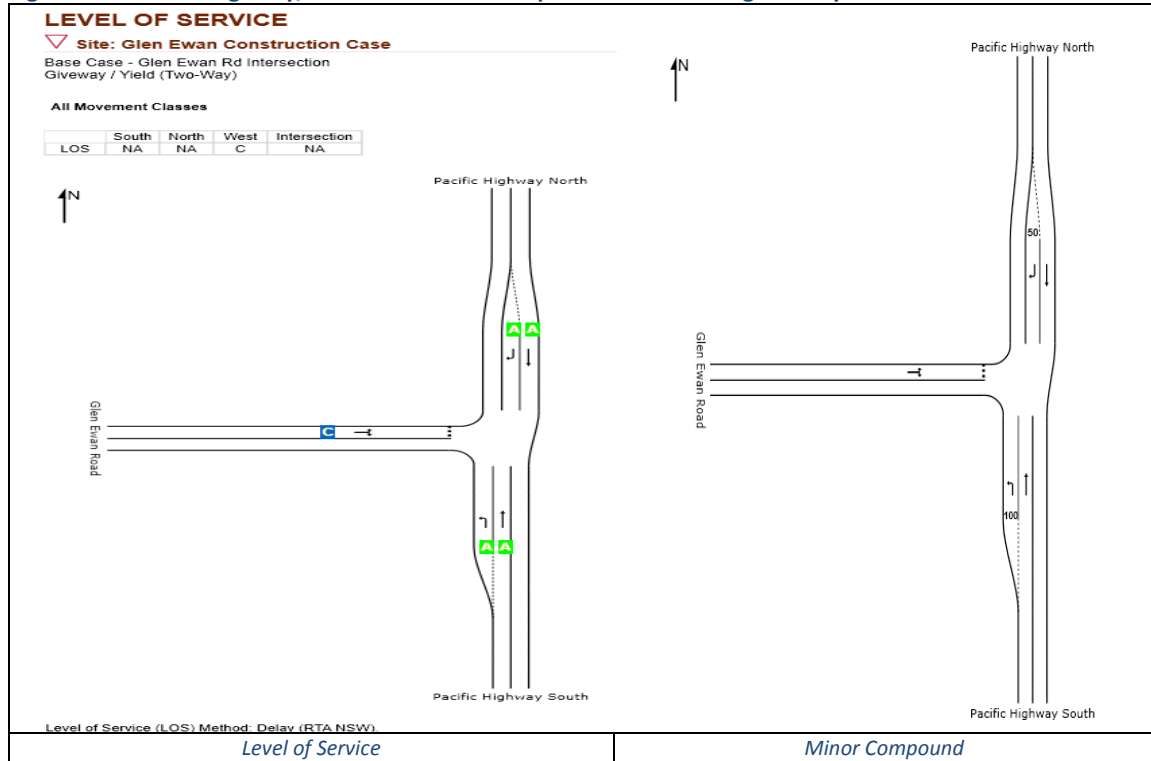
Pacific Highway/ Stn 6900 - Proposed construction geometry
